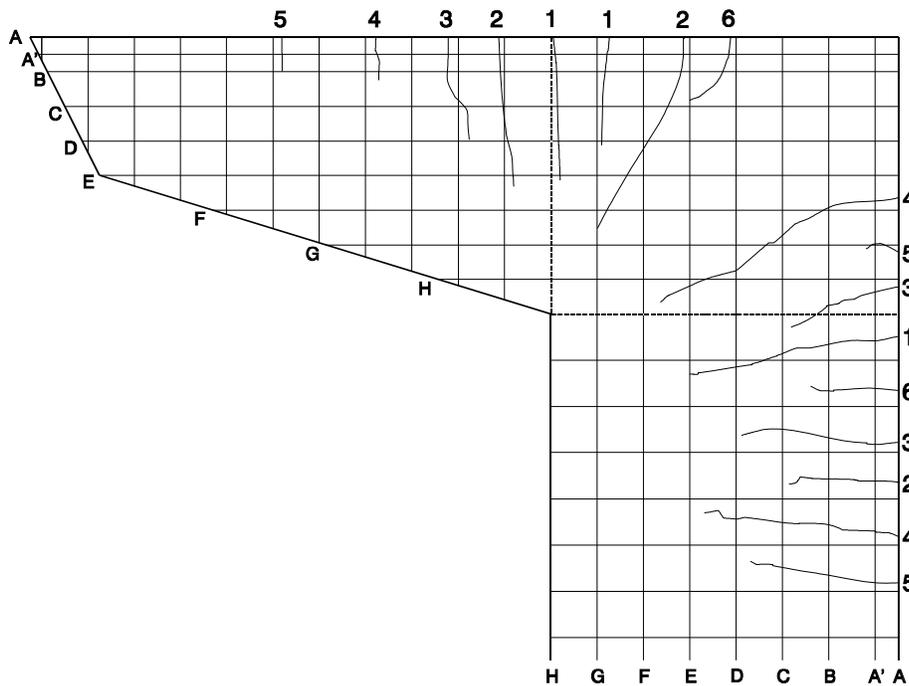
POJ-RC-100 cracking pattern on south face of specimen at dead load
